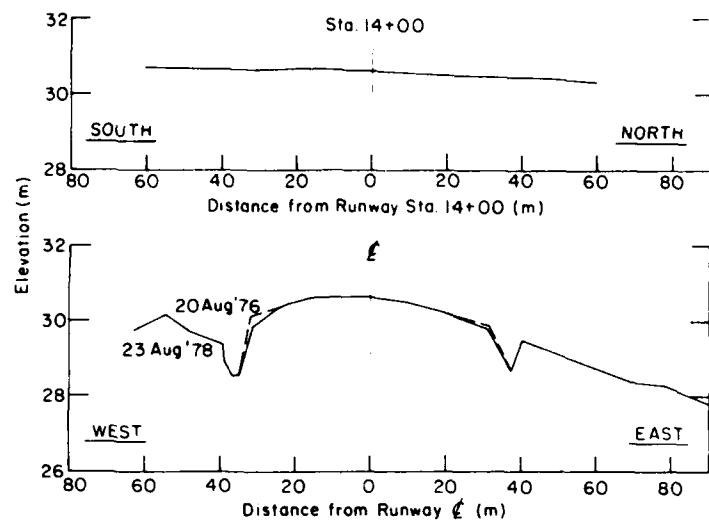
Surface elevations, south site, Prospect Airfield. The upper graph shows the elevations on the centerline profile, 23 August 1978; the lower graph shows the elevations on the cross section, runway station 14+00.
